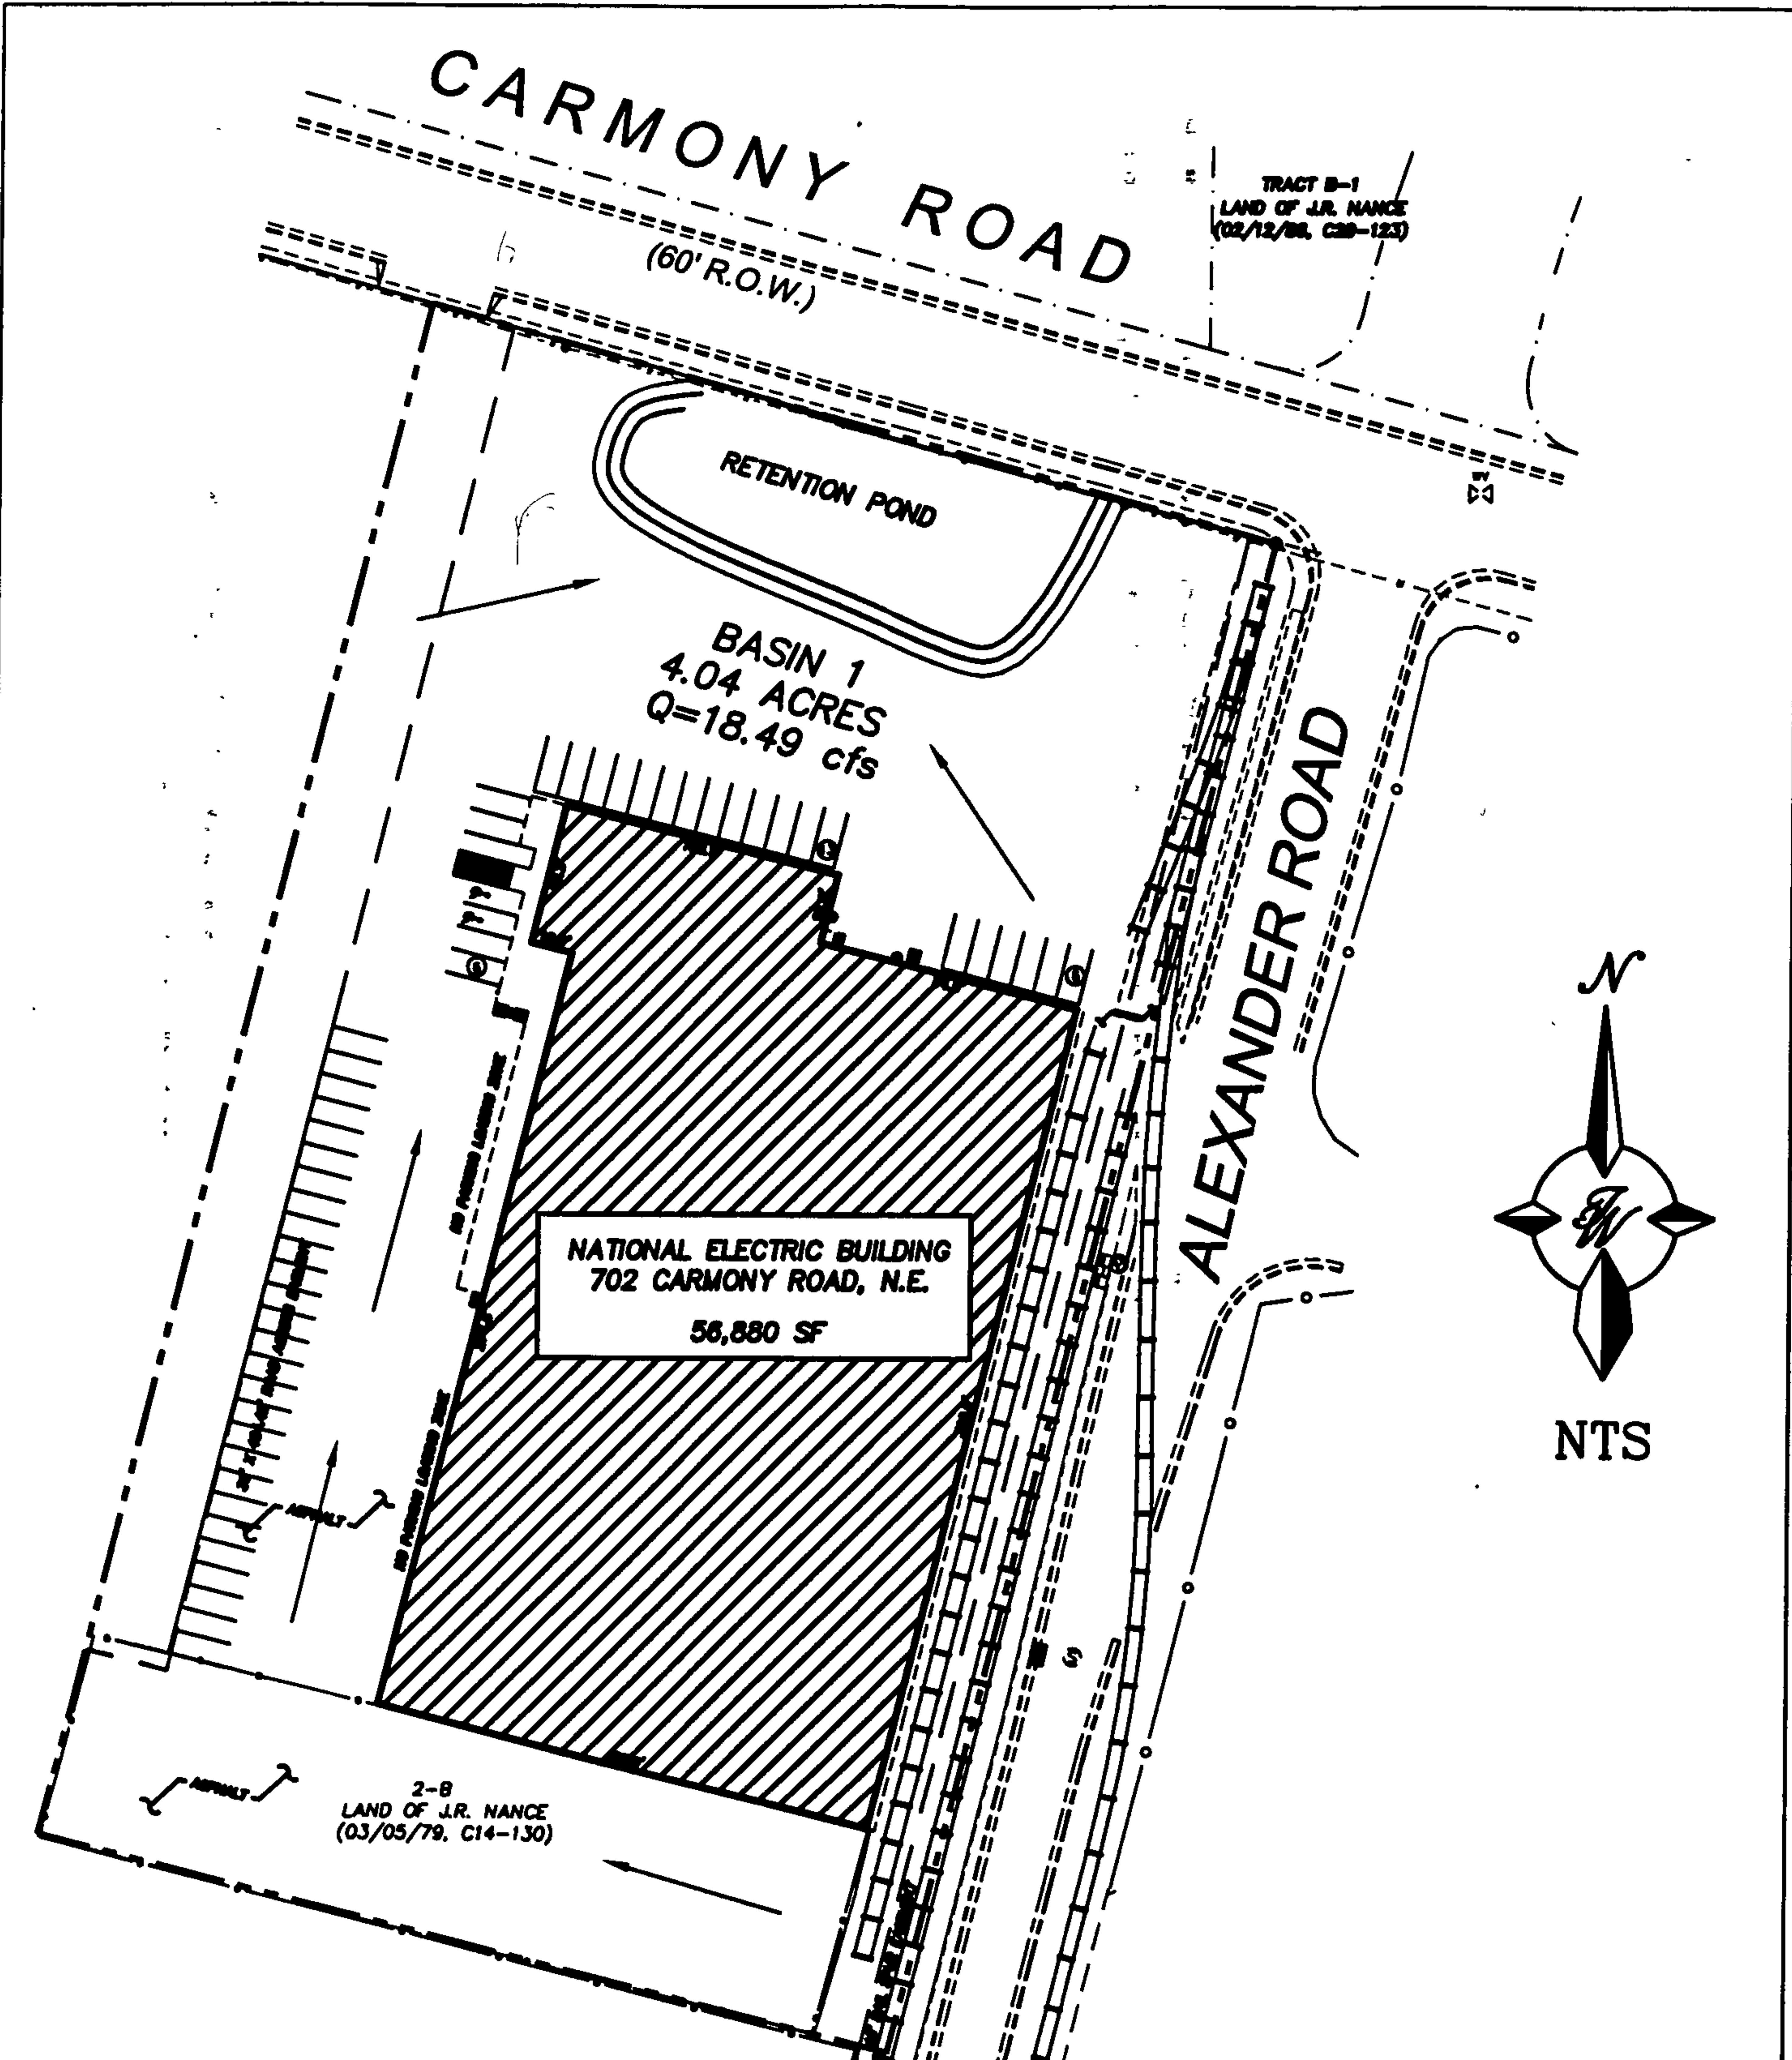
EXHIBIT C - EXISTING BASIN LAYOUT MAP
